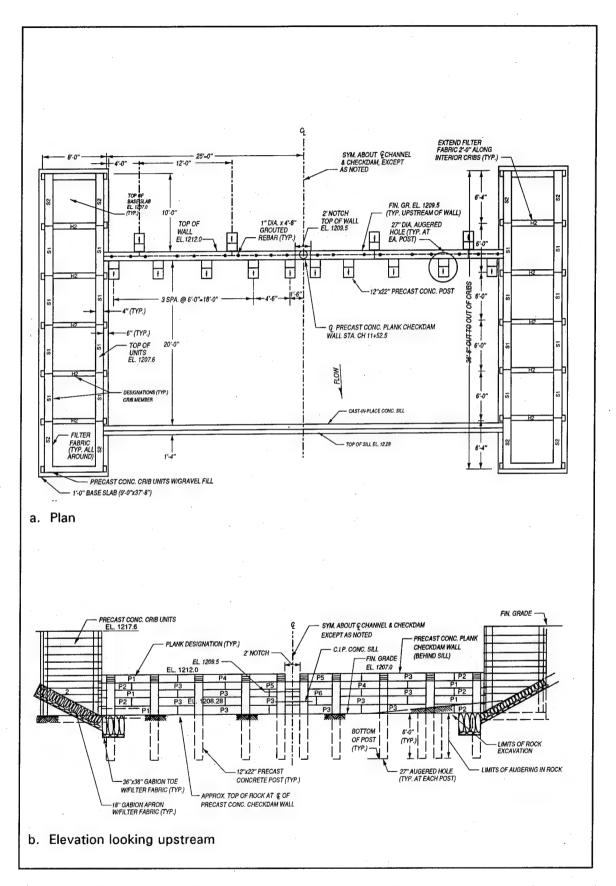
Structural plan and elevation, Chauncey Run Checkdam No. 2 (after Allen 1991)
